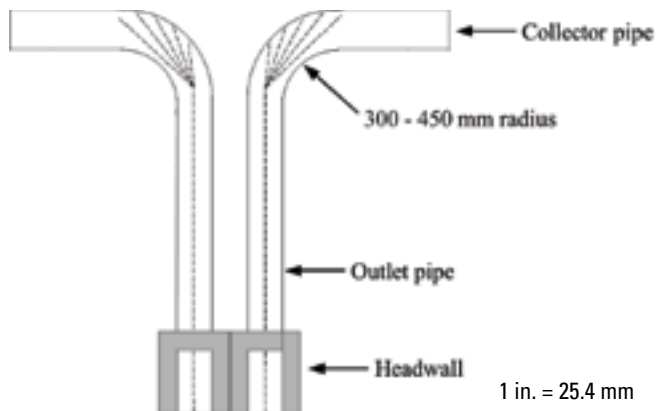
Recommended outlet detail to facilitate cleaning and inspections (FHWA 1992)
